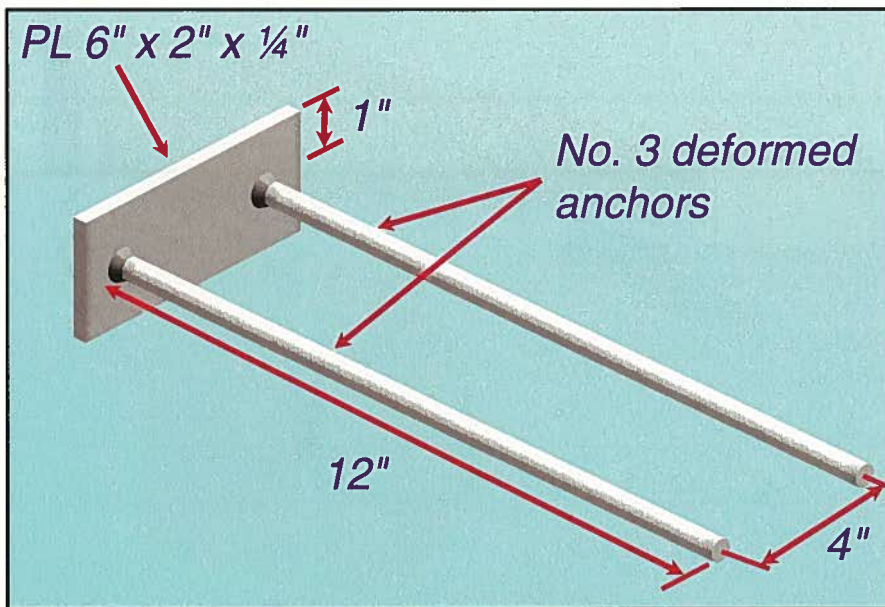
Details and dimensions of the stud-welded anchor and plate connectors (2 in. flanges). Note: 1 in. = 25.4 mm.
